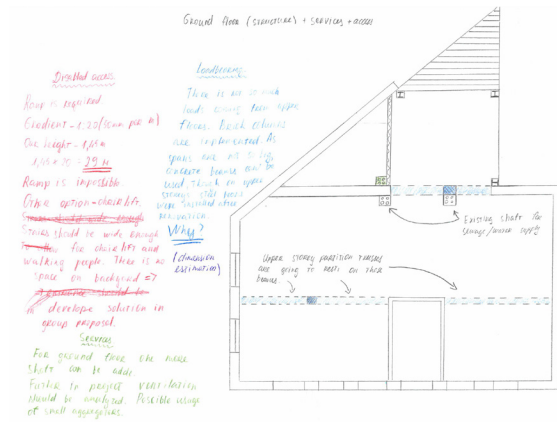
Initial sketch of the beam - column structure for the ground floor
